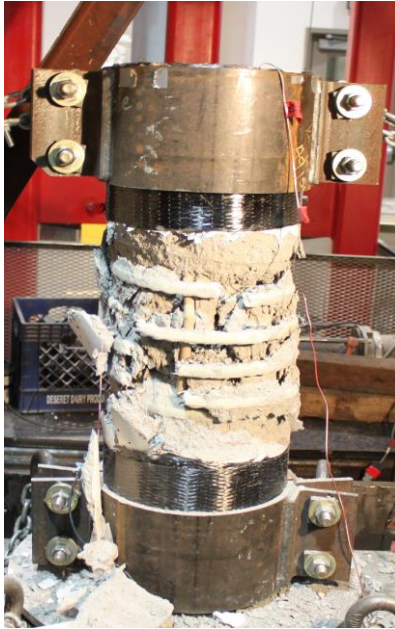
Concrete prism reinforced with GFRP spiral #4@2 at failure.
